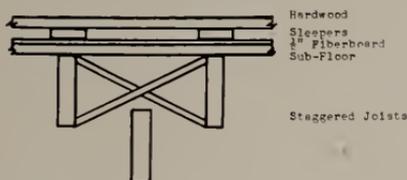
HIGHLY INSULATIVE FLOOR FOR HOUSE OF WOOD-FRAME CONSTRUCTION
